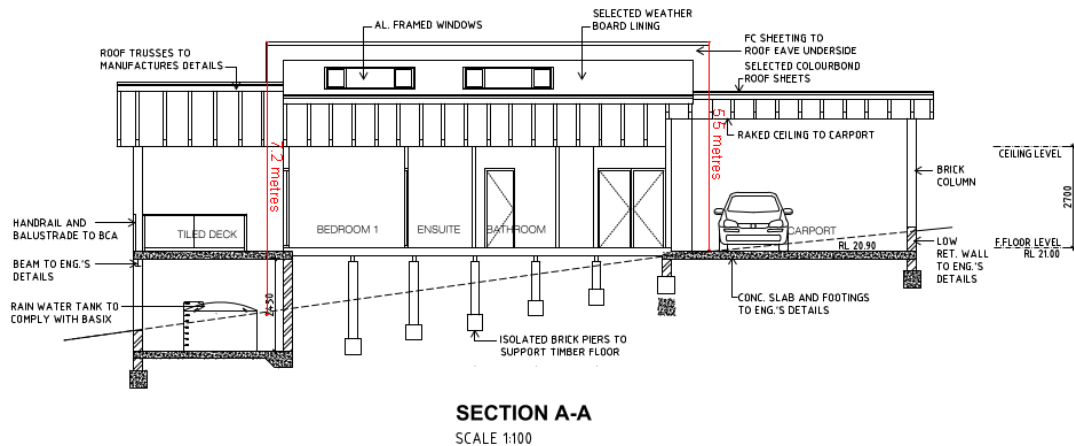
Extract of Section A-A (Drawing No. 2-2 1008 22, Issue 3, dated 6 February 2024) depicting building height.
